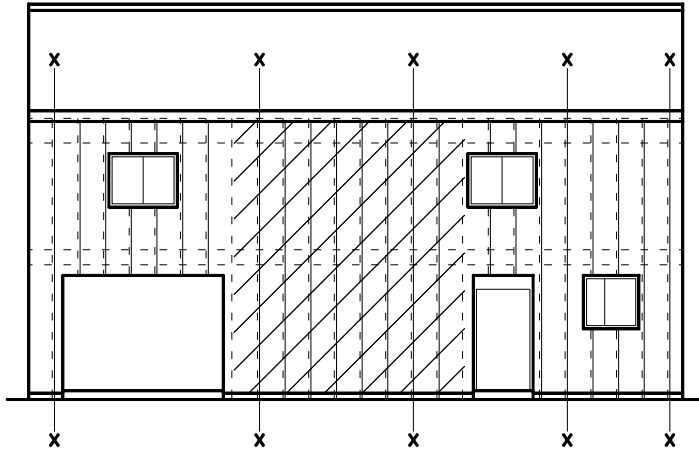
Typical cassette wall in house construction (Davies, 2005)
